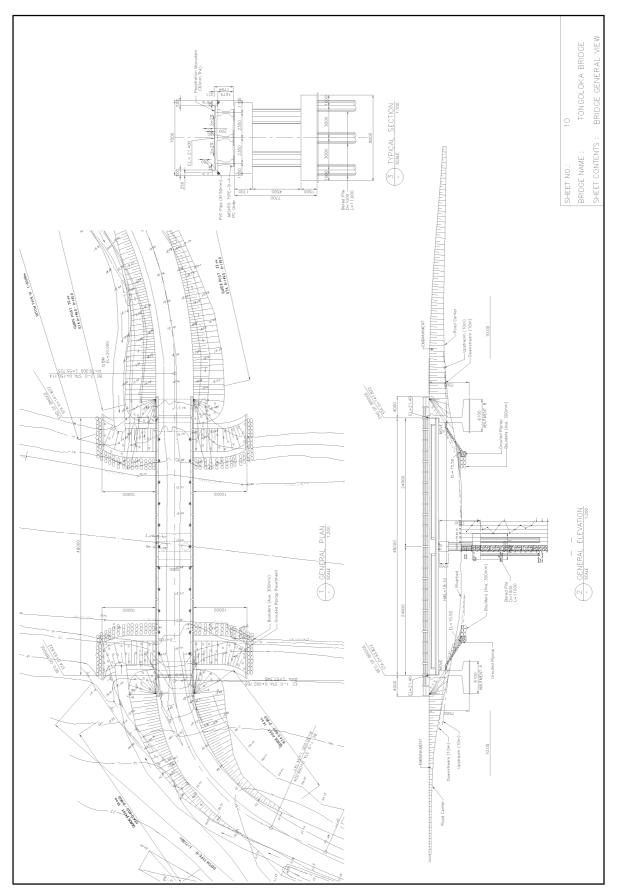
Bridge General View of Tongoloka Bridge
